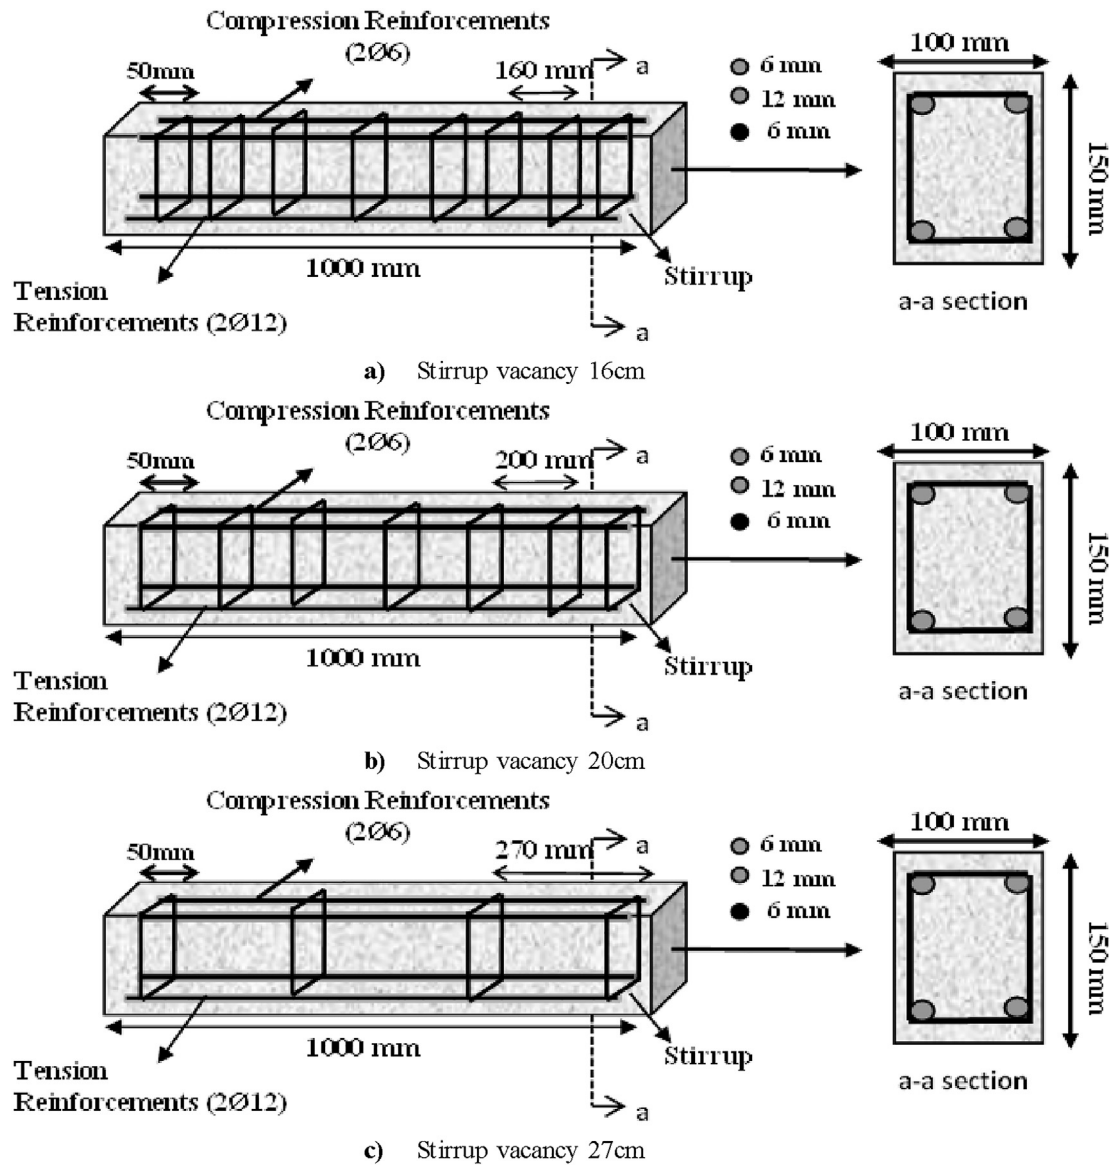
The general view of the reinforcement layout; a) stirrup spacing of 16 cm, b) stirrup spacing of 20 cm, c) stirrup spacing of 27 cm.
